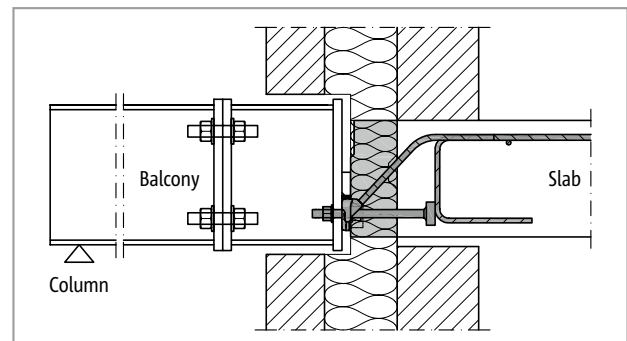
Schöck Isokorb® T type SQ: Insulating element within the core insulation zone; steel stub adjuster between the Isokorb® and the balcony for flexible construction workflows
